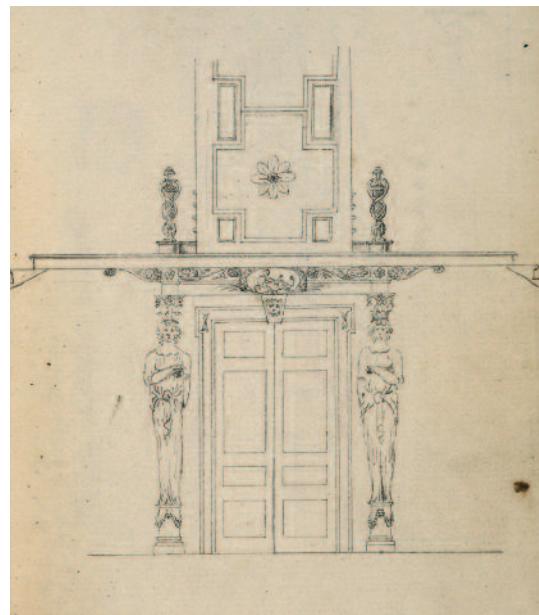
Henry Holland, Rejected Design for entrance to Basement Floor at Carlton House, 1788, (RIBA, SKB122/4)
